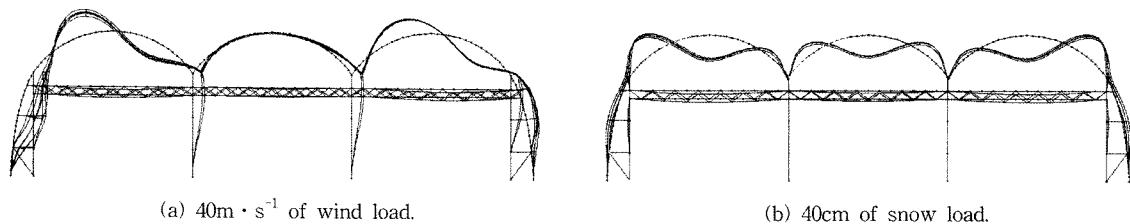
Deformed shape of the elevated eaves height 1-2W A-type plastic greenhouse with effective reinforcement method, RM 03 under design loads.
